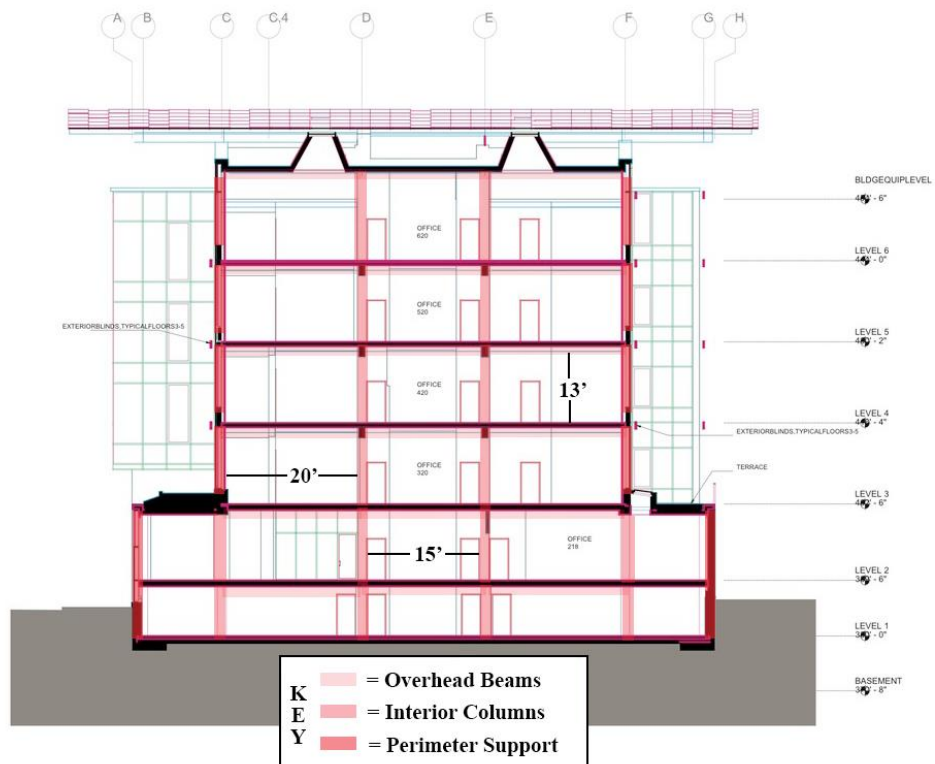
Structural Systems: Section B. Adapted from Archdaily & MHP
